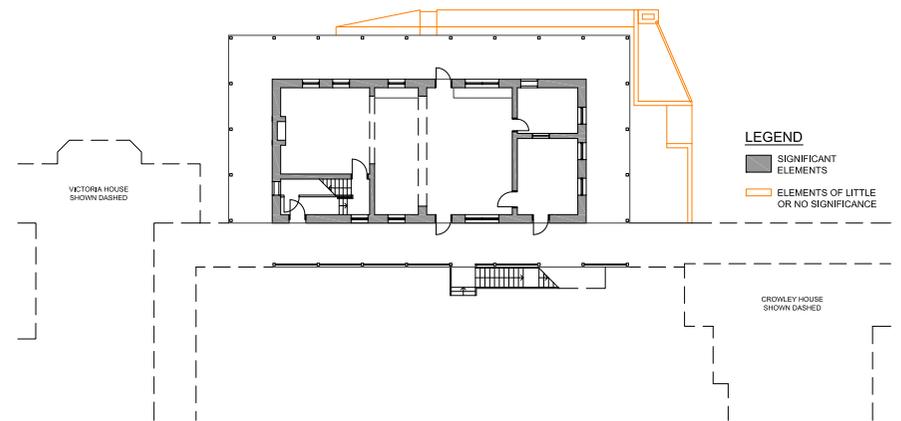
C - CAMPBELL HOUSE GROUND FLOOR
